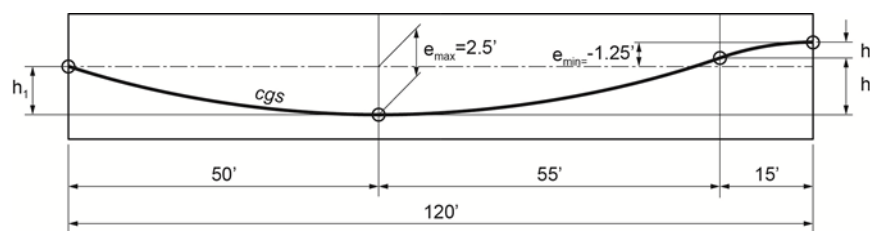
Center of Gravity Profile of Prestressing (End Spans)
